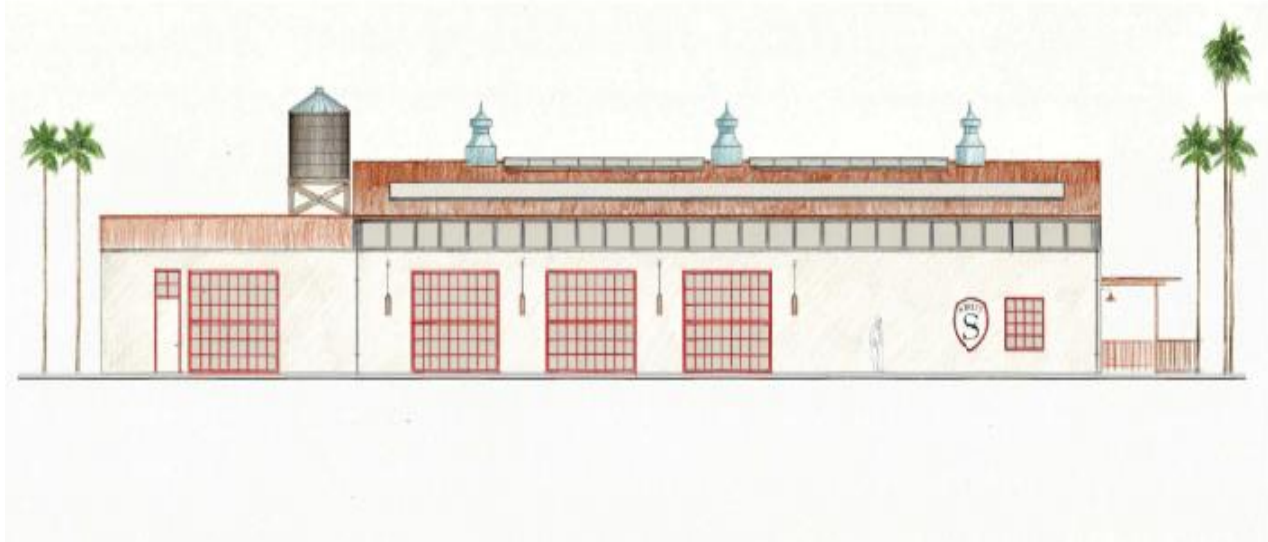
View of Proposed Front Elevation of Building
